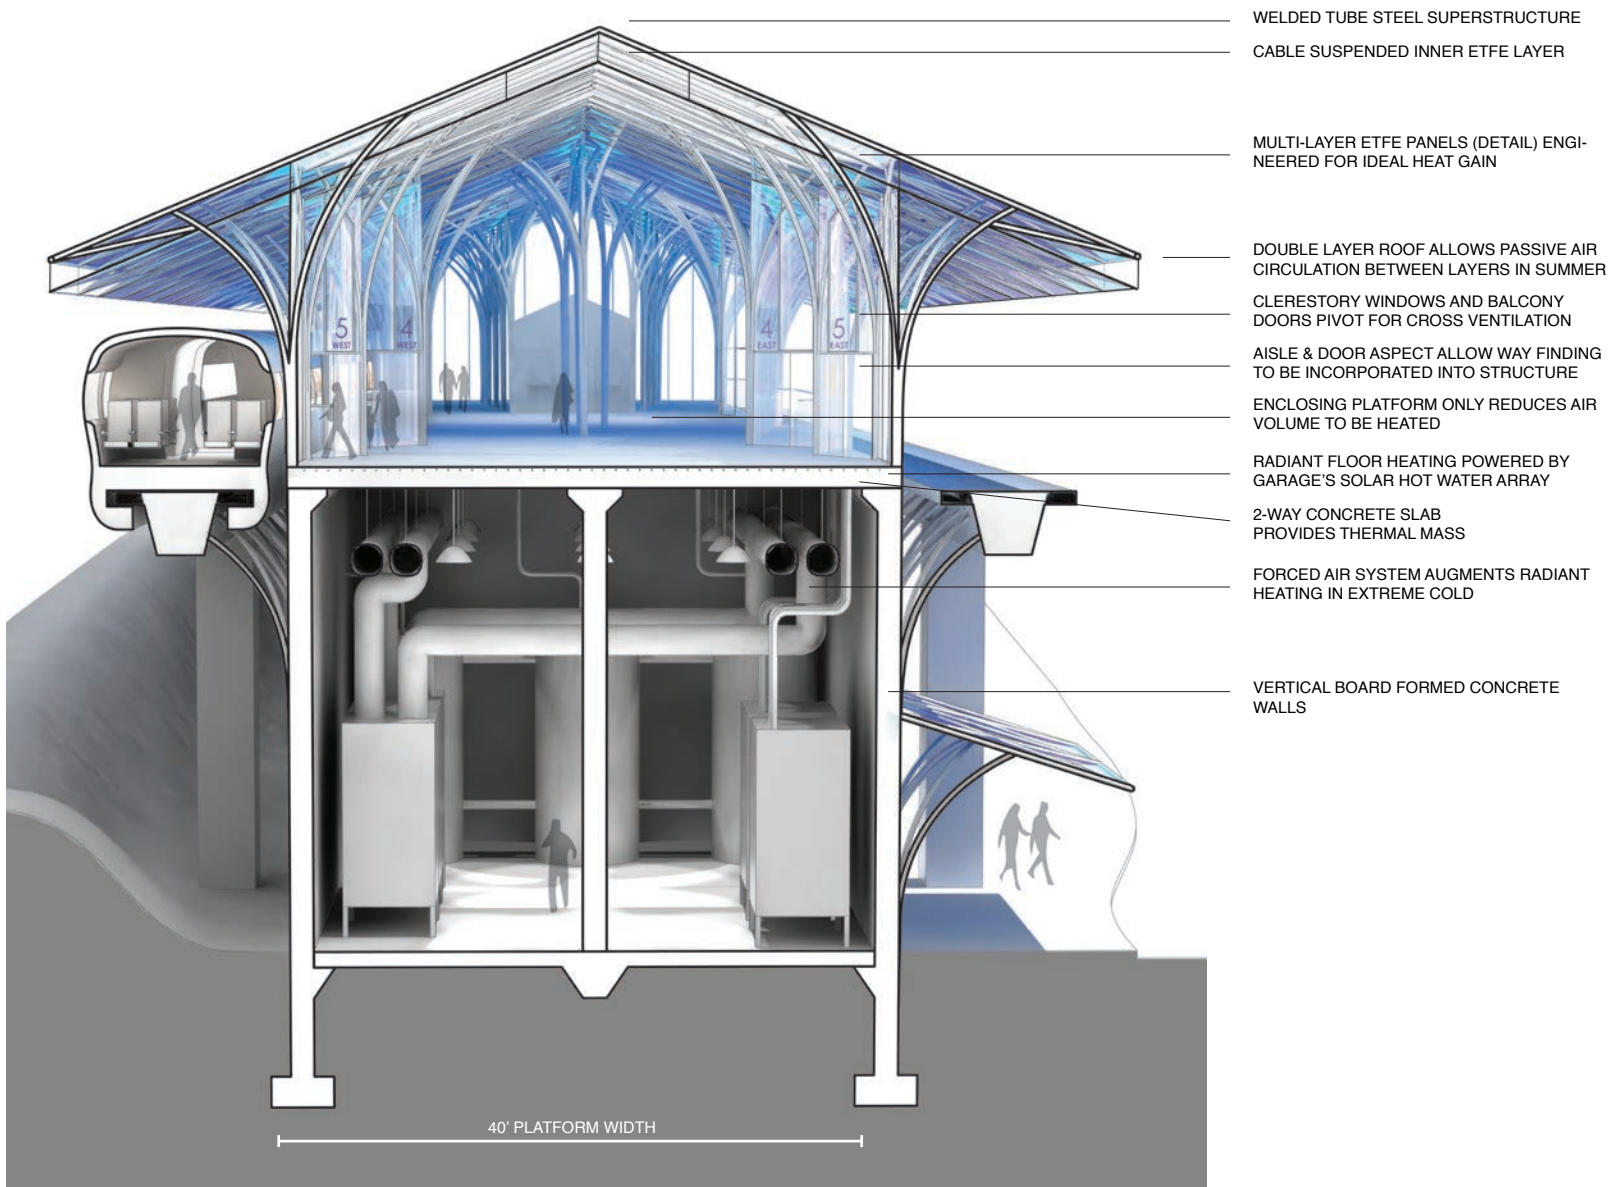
SUSTAINABILITY & STRUCTURE - PLATFORM TRANSVERSE SECTION
